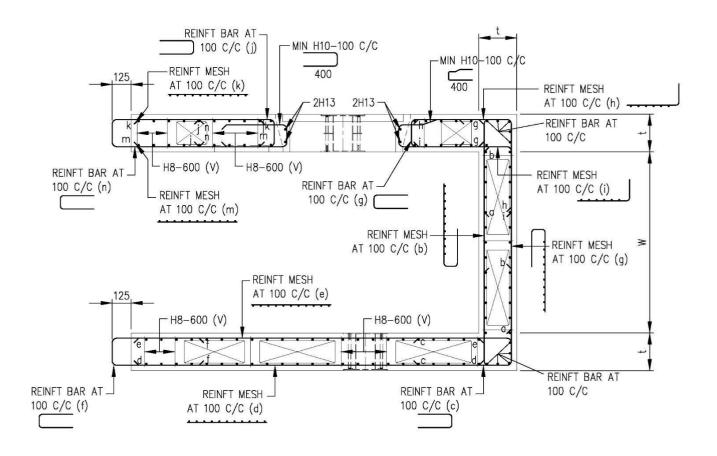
(d) REINFORCEMENT BAR DETAILS OF WALL AND RIB FOR C-SHAPED PRECAST HS
